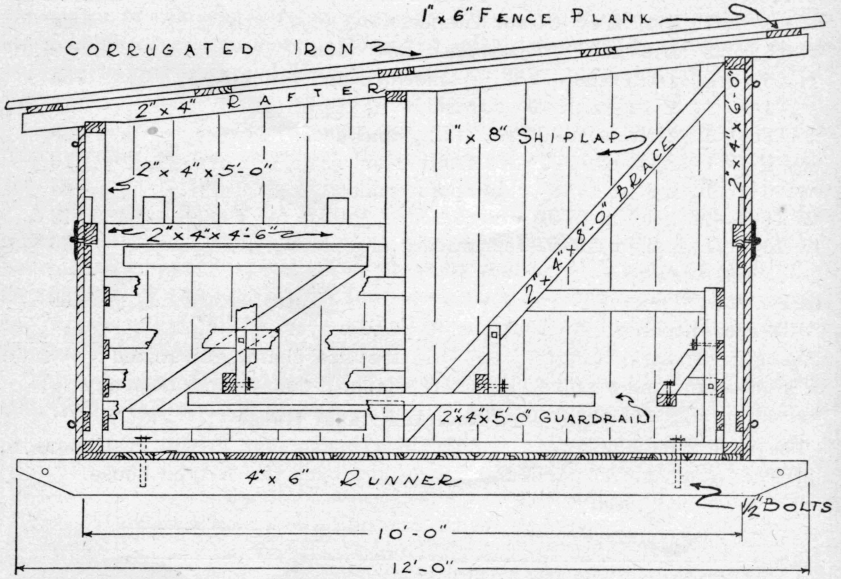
Cross sections of shed-roof house showing slats over door openings and installation of guard rails
